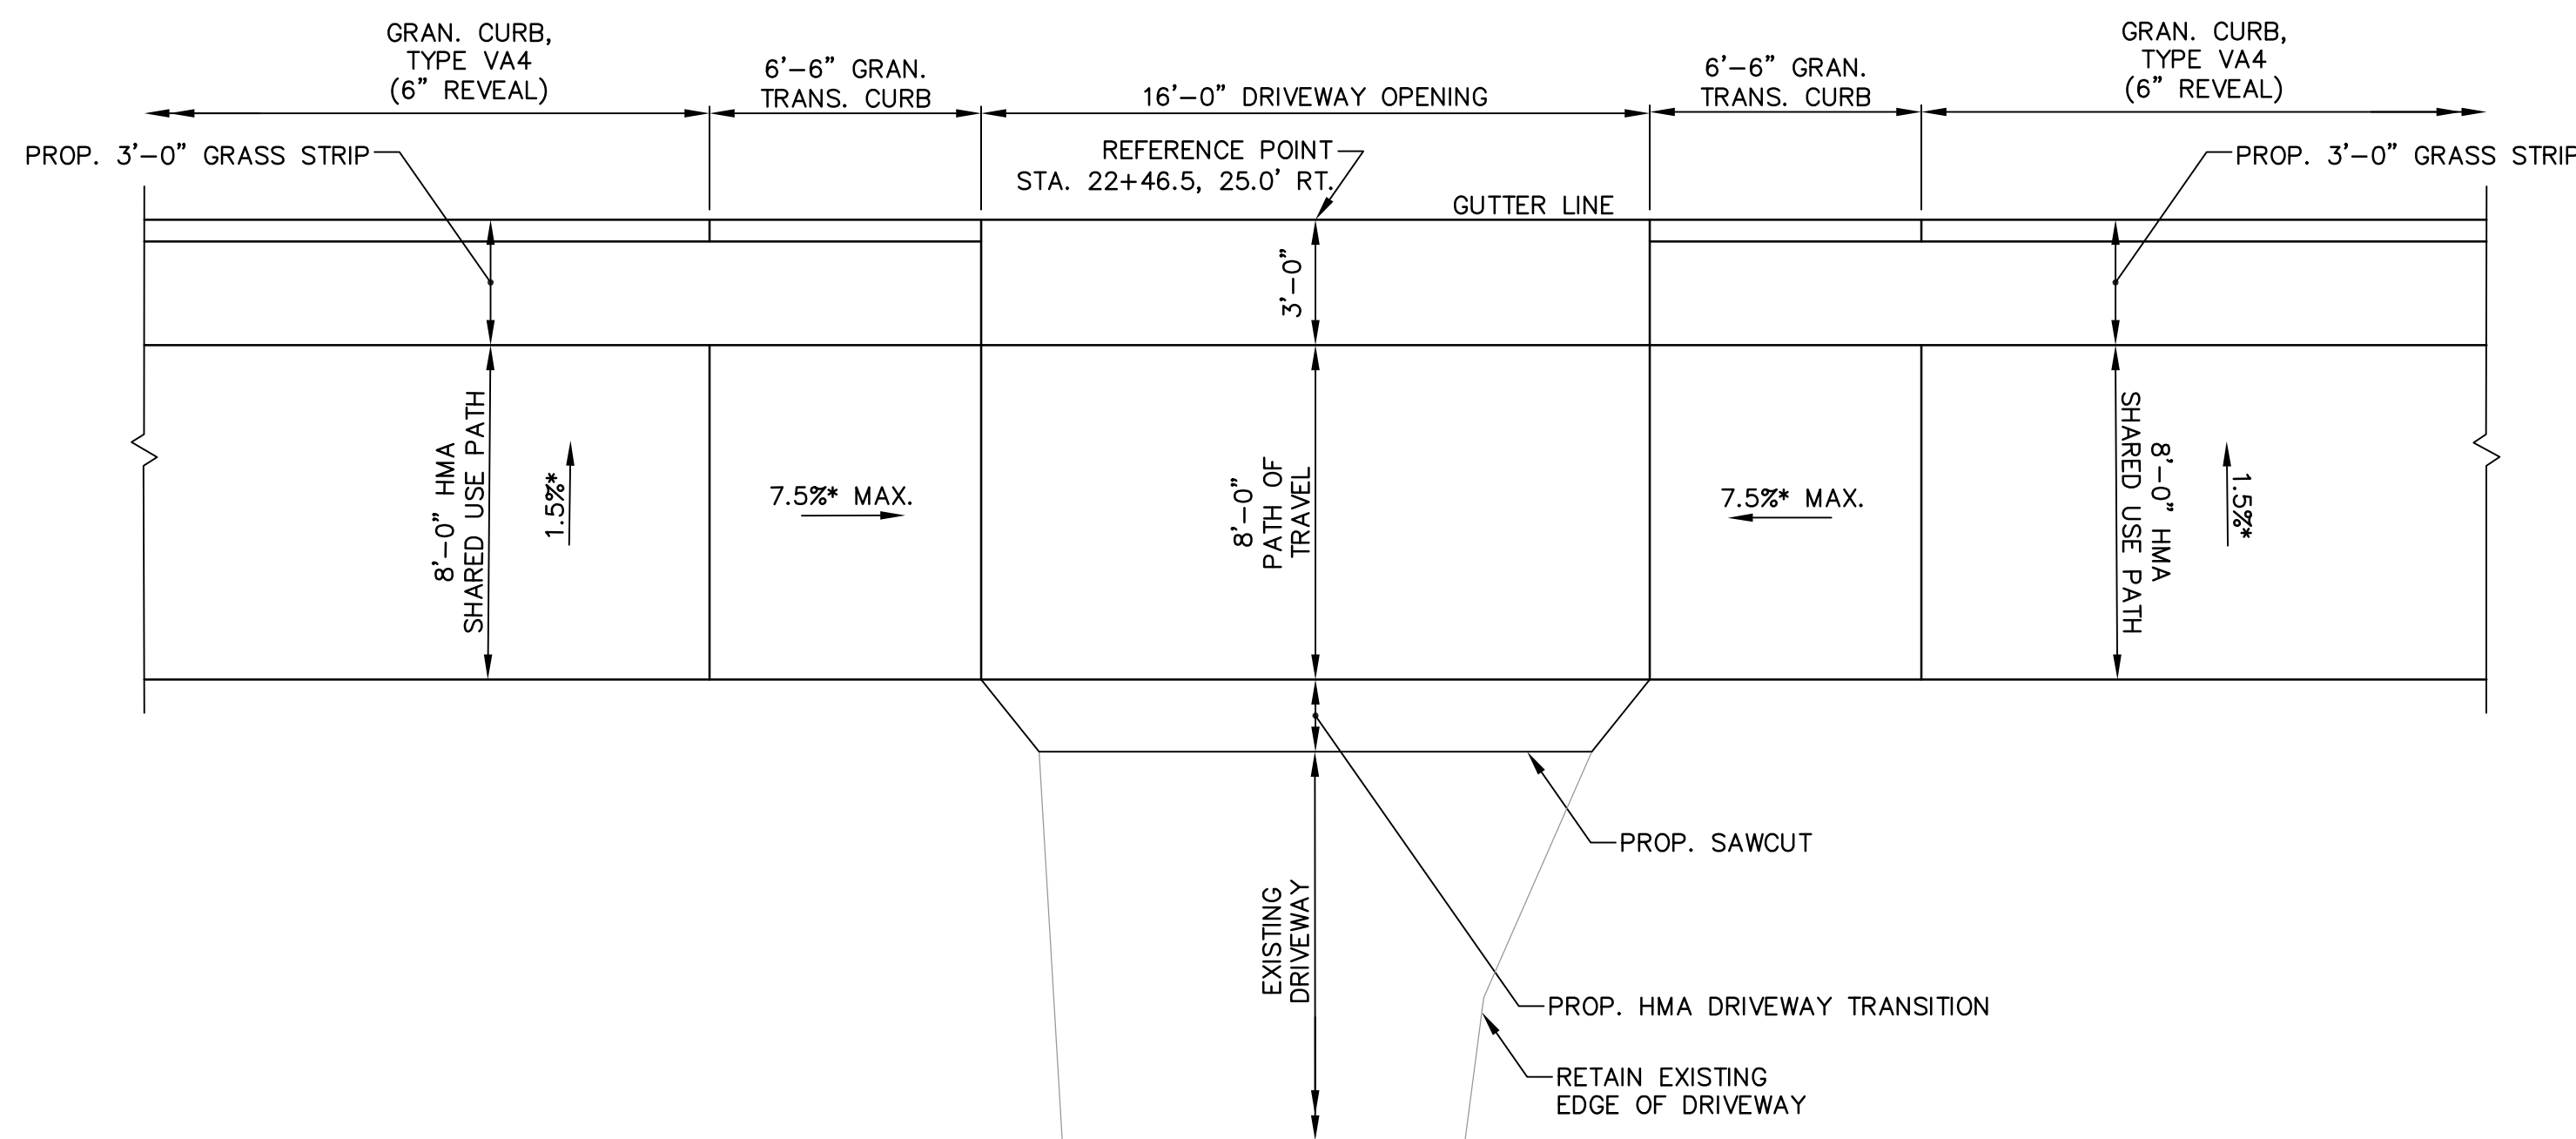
DETAIL FOR WHEELCHAIR RAMPS #2, 3, & 4
